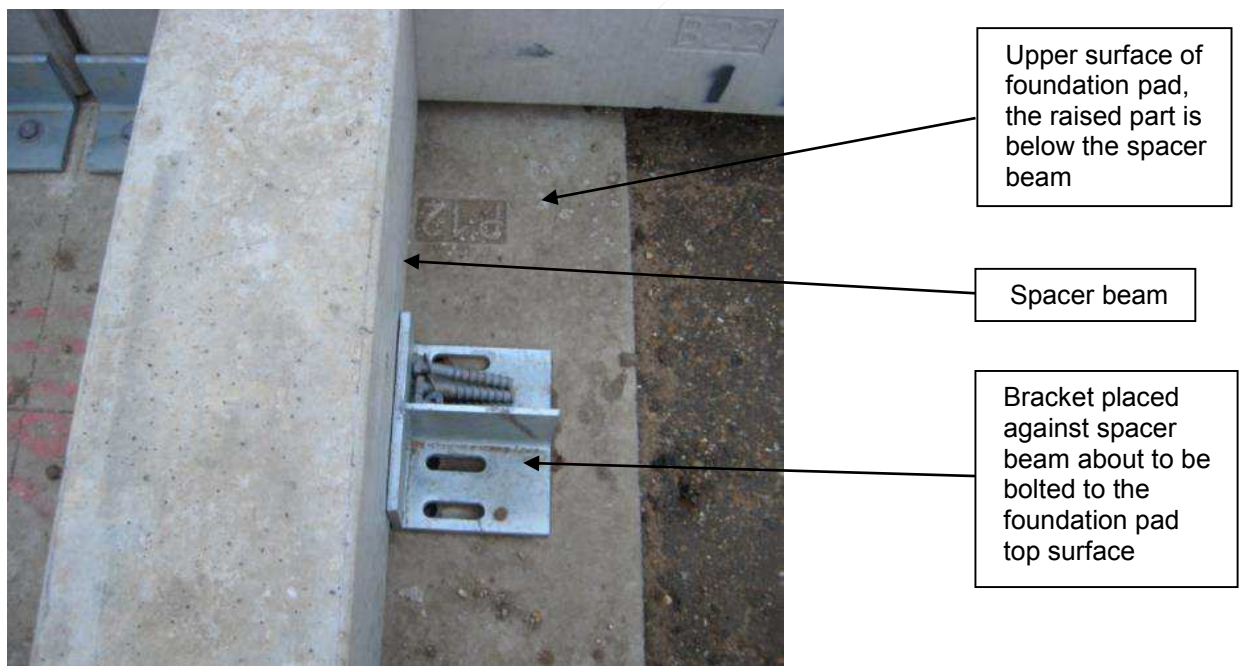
Photograph of a 'fixed' joint longitudinal restraint bracket.
